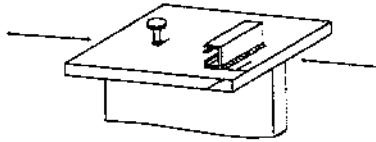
UKDEn Detail in Welded Girders 3
